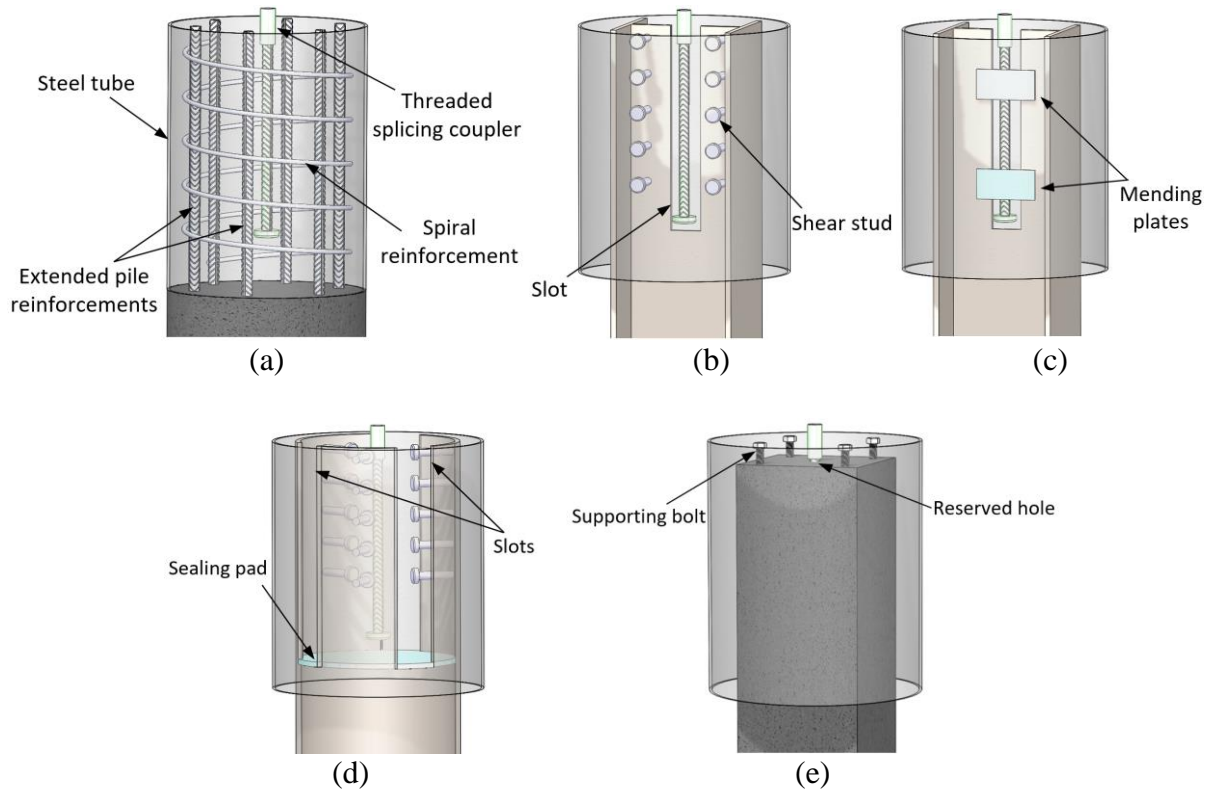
Pile head details for (a) bored pile; (b) steel H-pile with shear studs; (c) steel H-pile with welded mending plates; (d) steel pipe pile; (e) driven concrete pile
